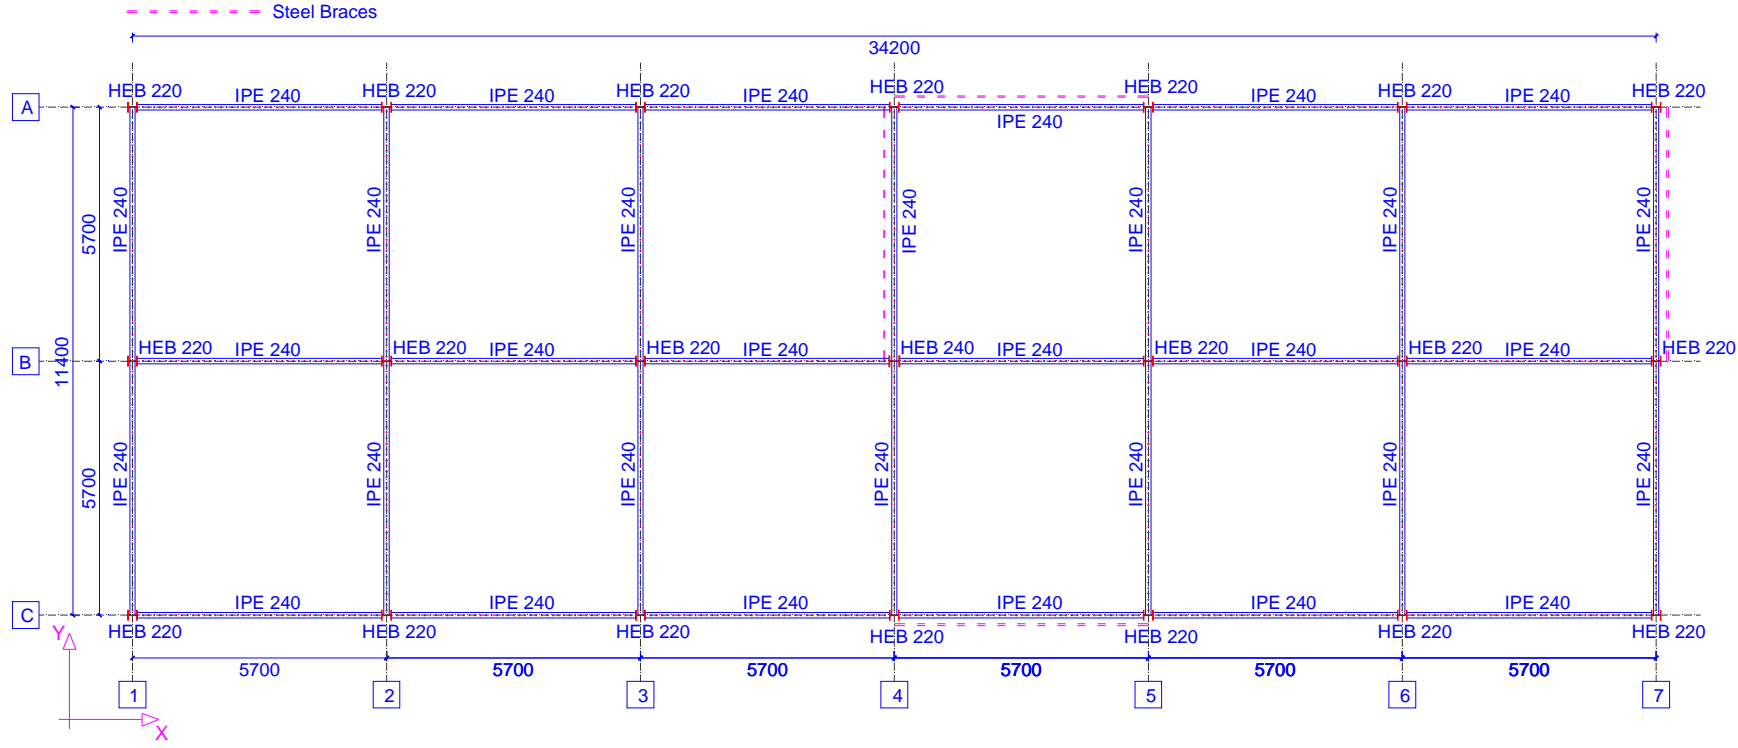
Floor Framing Plan – Symmetric Configuration (length unit mm)
